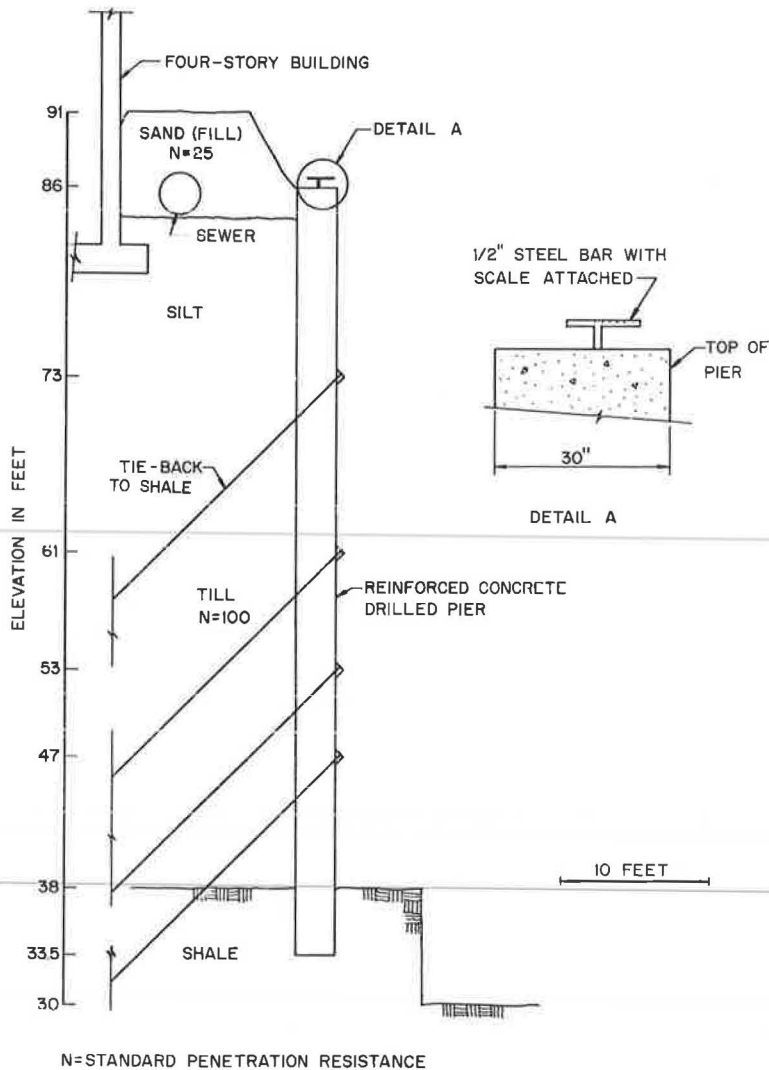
Berri-DeMontigny subway station, Montreal: typical section of anchored wall.
